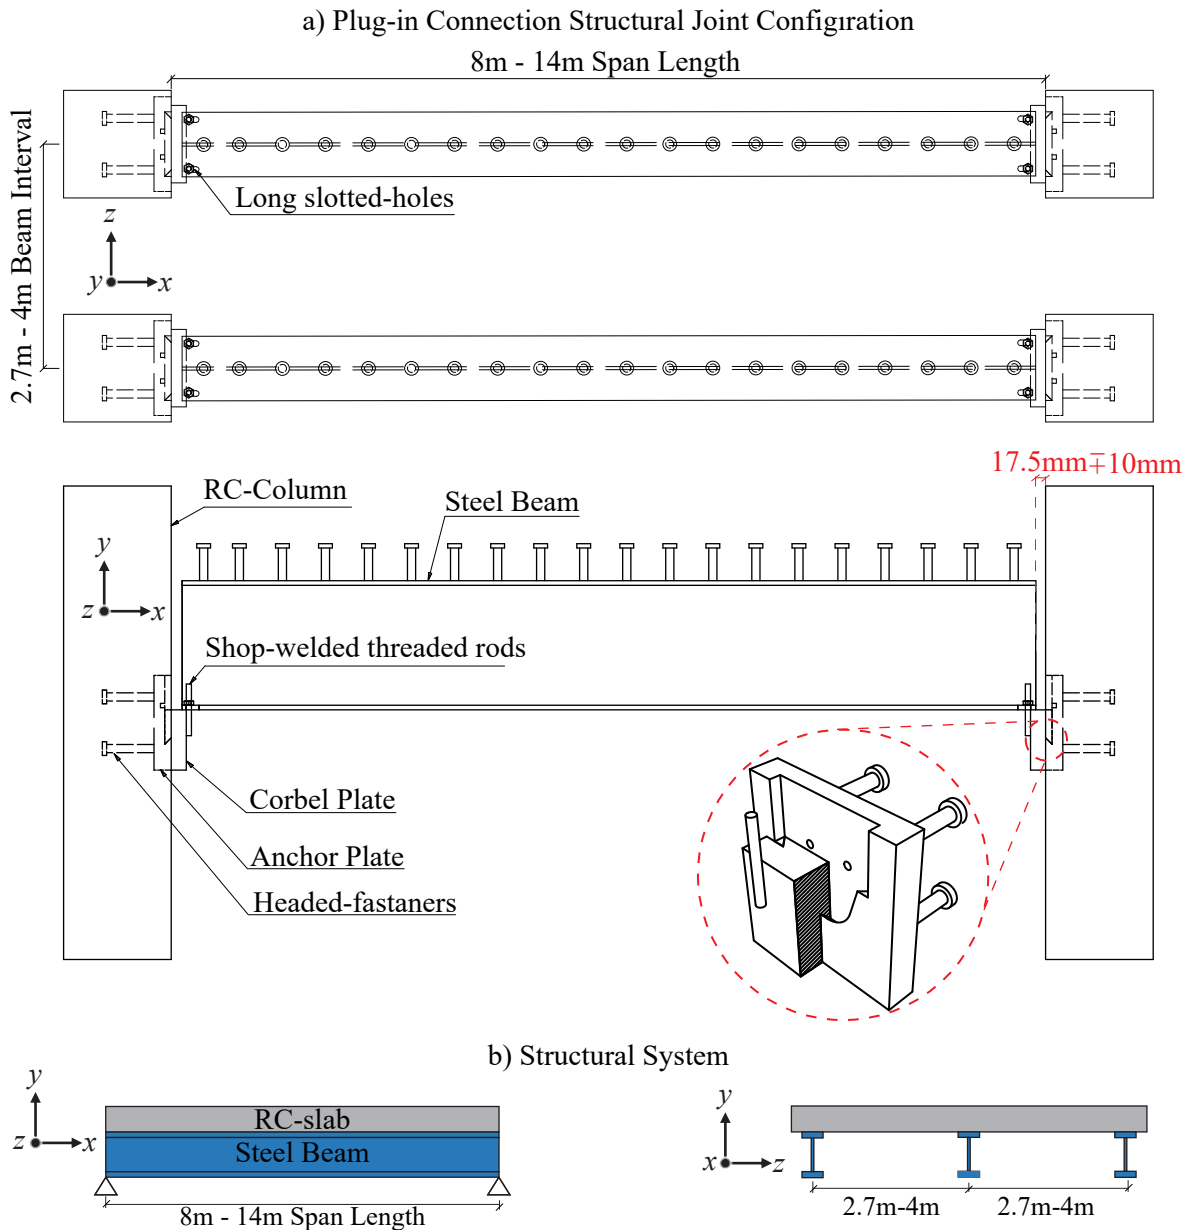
Plug-inC joint in reinforced concrete (RC) column configuration.
